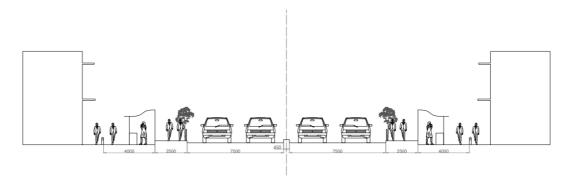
Proposed cross-section of 2.5m footpath length (NH 102) - RoW 28M
